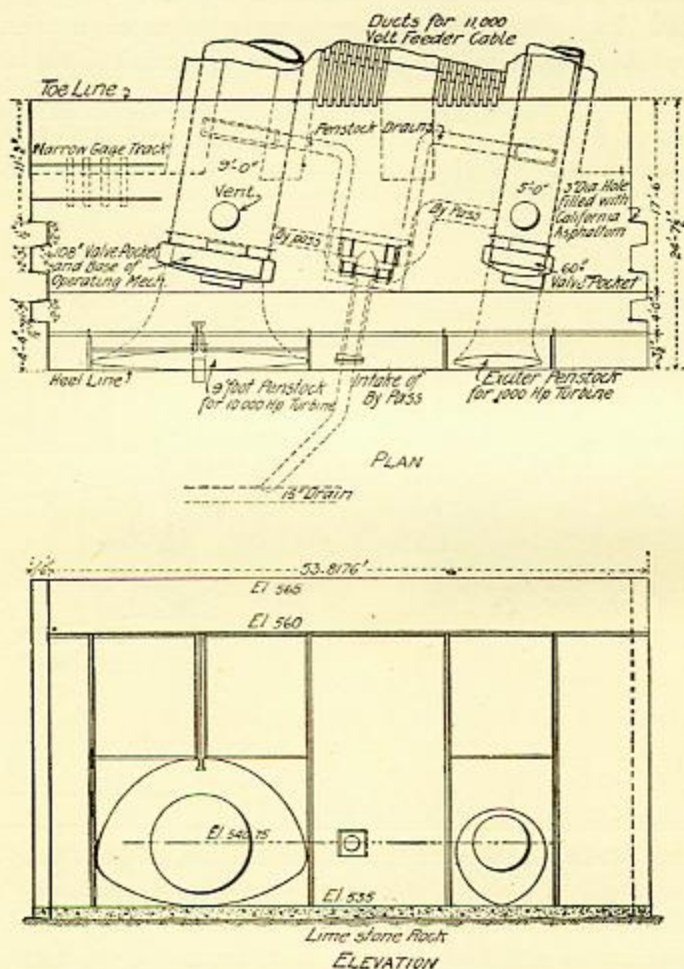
Plan and Elevation of Forebay Walls, The Niagara Falls Hydraulic Power & Mfg. Co.
